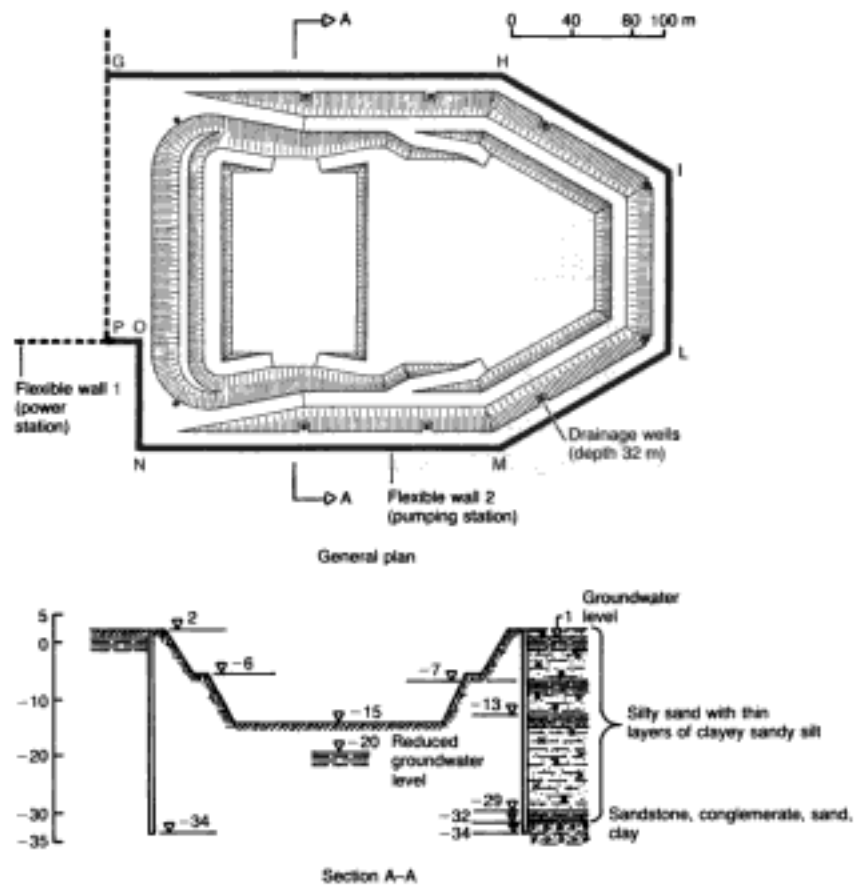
Plan and cross-section of deep excavation with cut-off and ten deep wells at Montalto di Castro, Italy (Tornaghi¹⁵)
